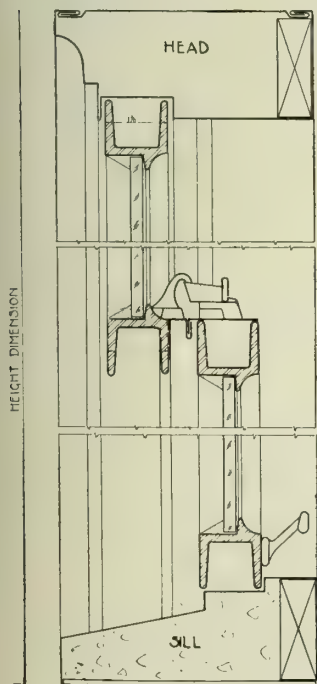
DETAIL VERTICAL TYPE REVERSIBLE STEEL WINDOW
